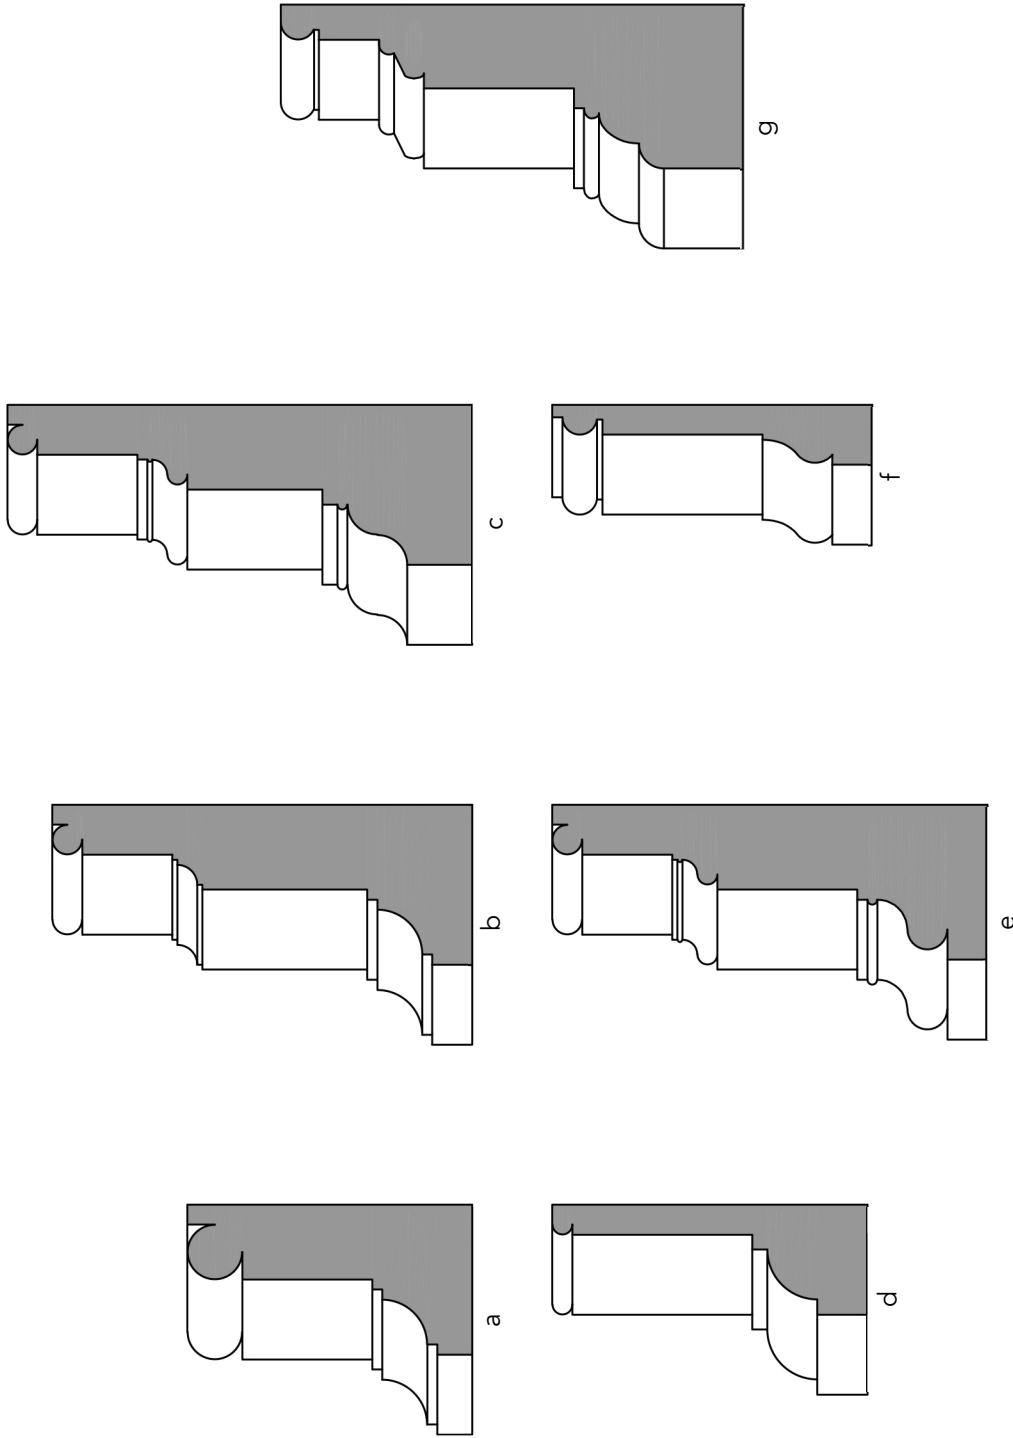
Lexicon of Architraves as seen at the Lee Cultural Center: a, single architrave with cavetto (Rooms 106 and 206); b, double architrave with cavetto (Rooms 105 and 205); c, double architrave with cyma-and-astragal and quirked-ogee-and-astragal, c. 1877; d, single architrave with ovolo (basement and garret); e, double architrave with quirked-ogee-and-astragal (Rooms 101, 102, 103, 201, 202, and 203); f, standardized molding, early-twentieth century; g, double architrave, 1998. Drawn by author, 2016. Scale: 5" = 1'.
